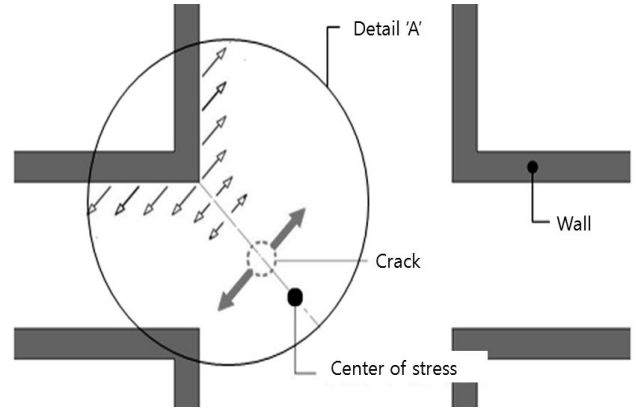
Causes of the crack at the edge of concrete slab (Wall)
